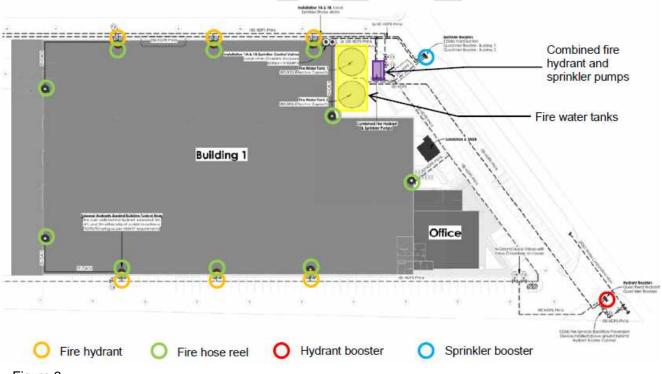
Site plan for 204 Bannister Road (Centuria, 2023)
